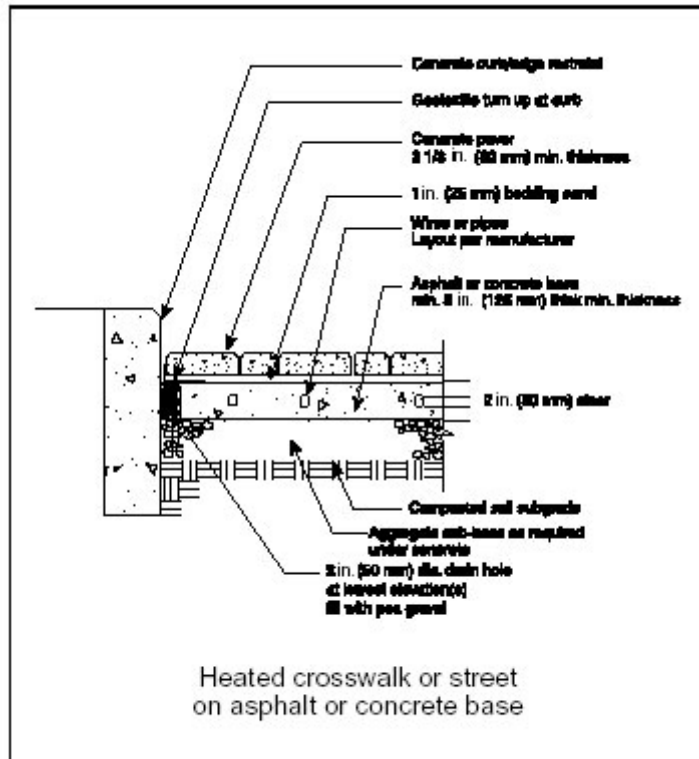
A typical cross section of a heated interlocking concrete pavement for crosswalks and roads subject to vehicular traffic.
